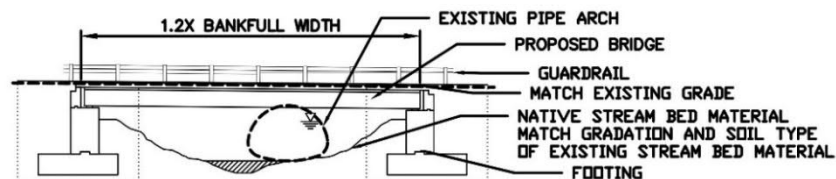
Typical detail of a bridge designed to meet the MA River and Stream Crossing Standards.
